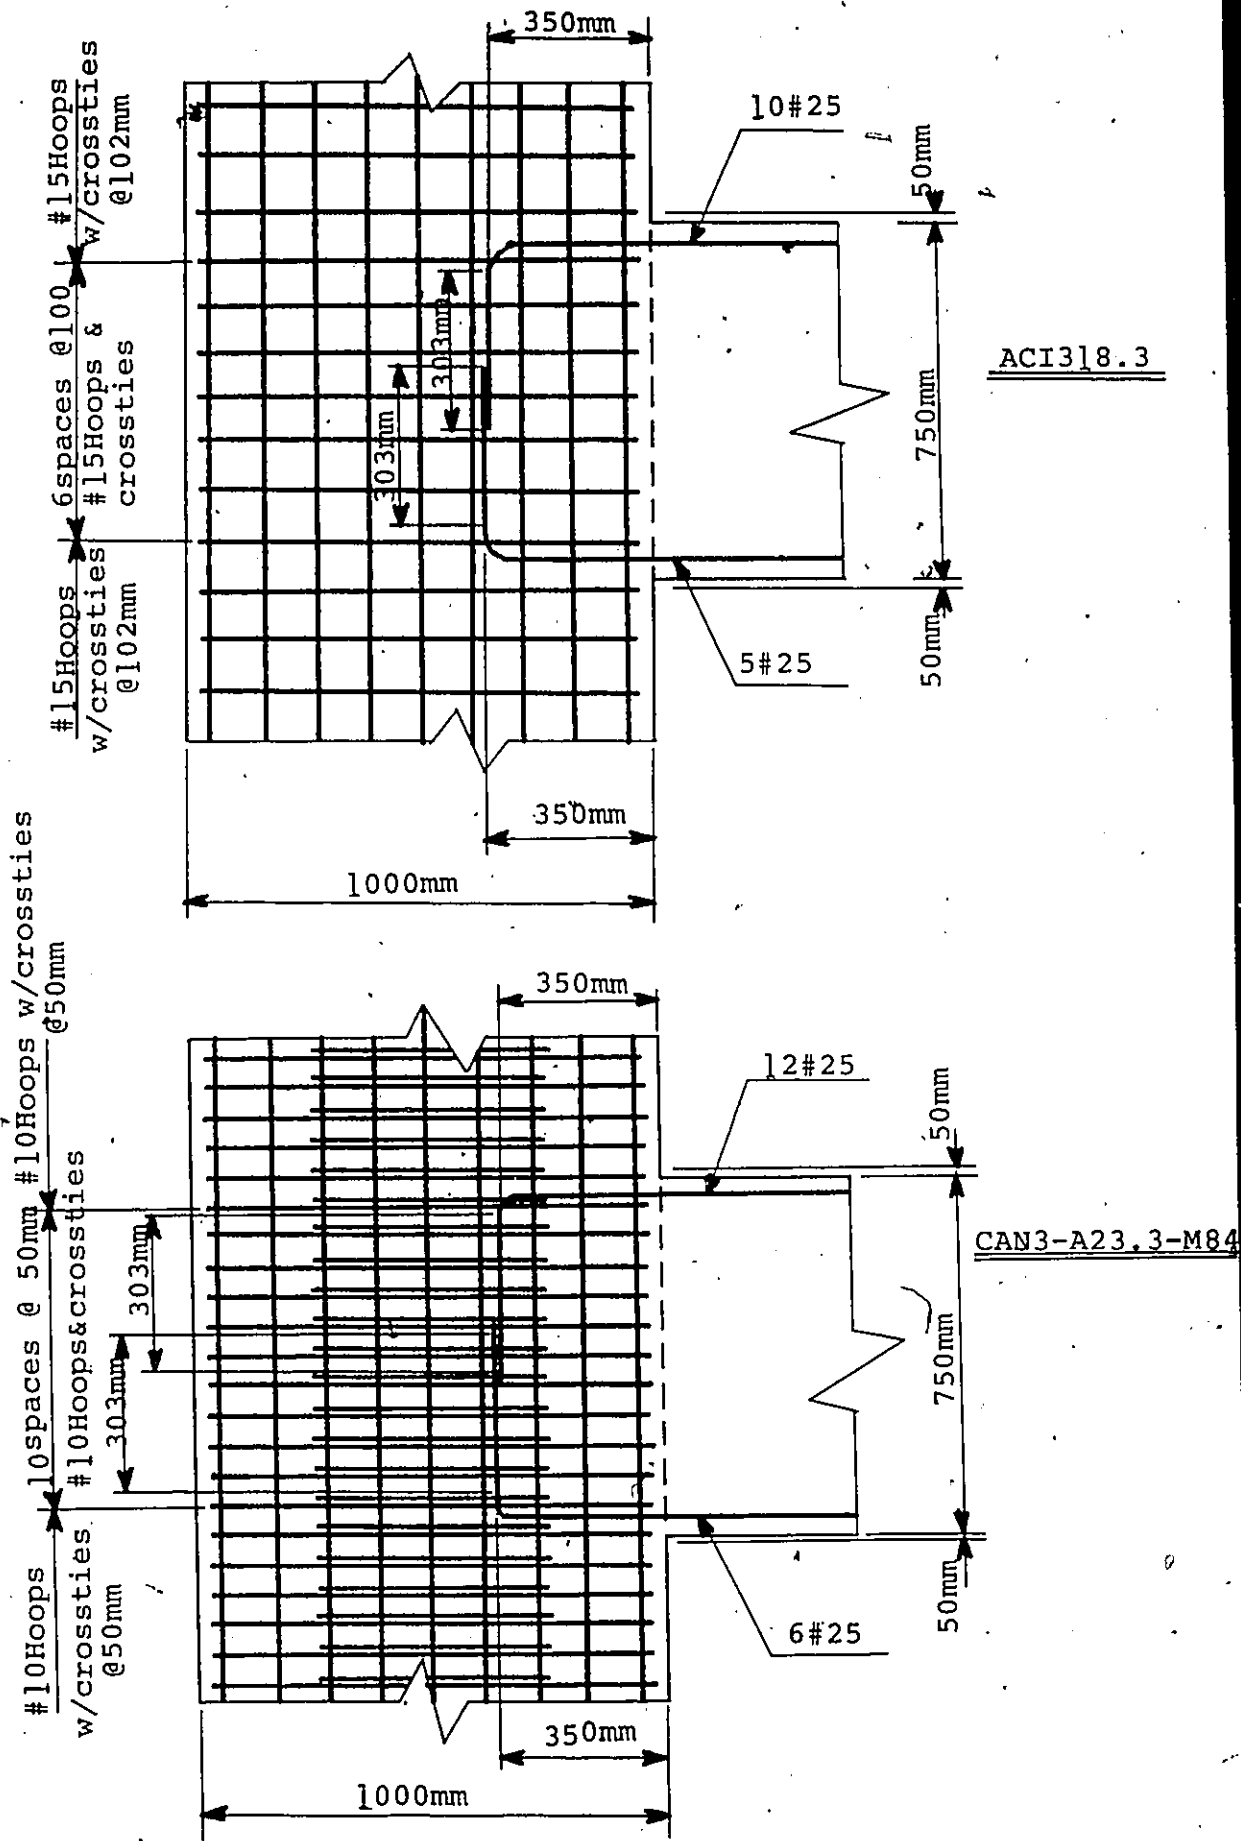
4 EXTERIOR BEAM- COLUMN CONNECTIONS
